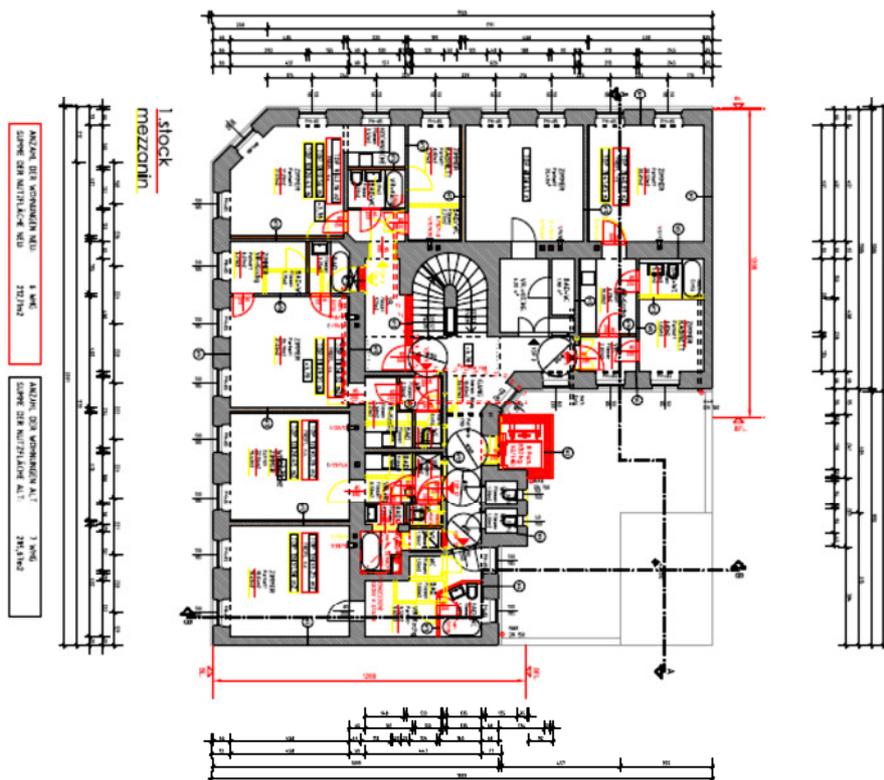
The plan of the structure at the 1<sup>st</sup> floor
